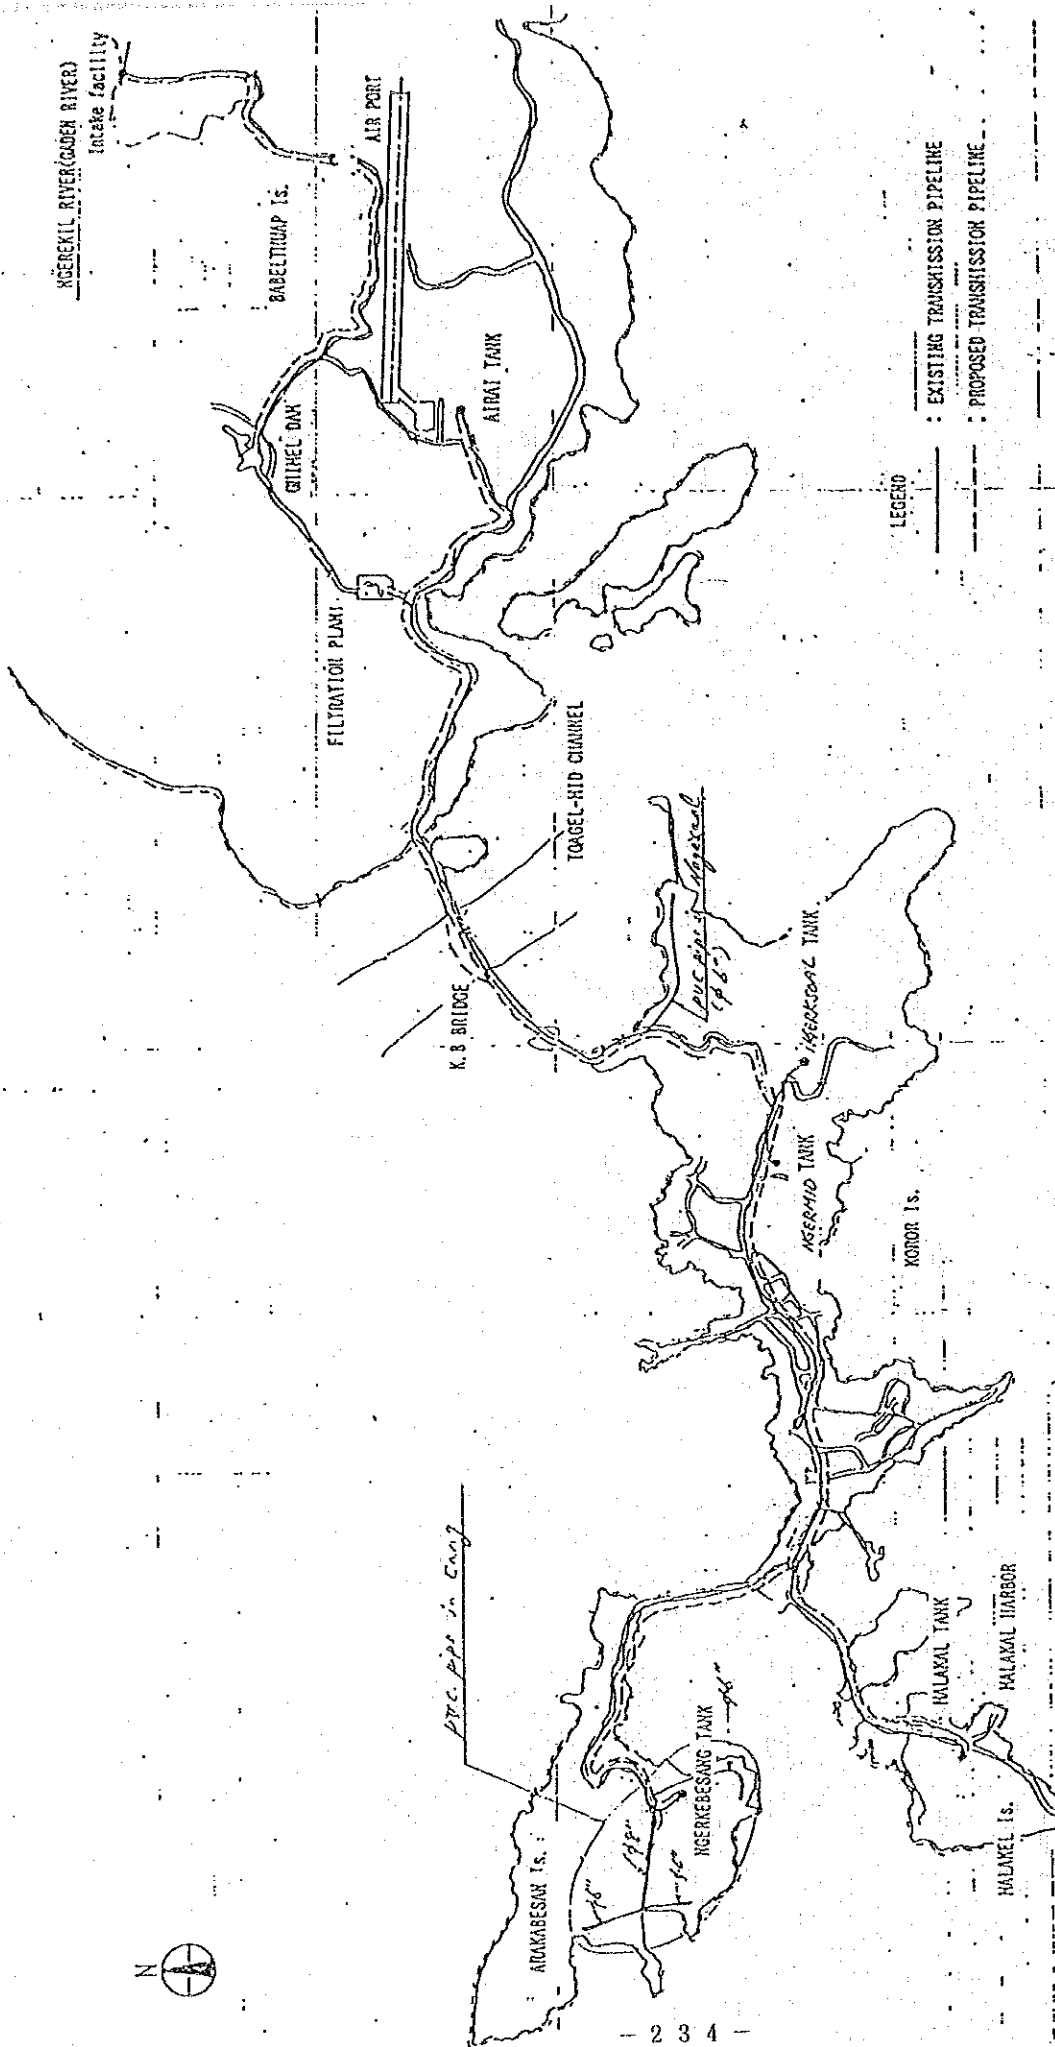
PORTION OF PVC PIPE TO BE INSTALLED BY US AID'S PROJECT.
